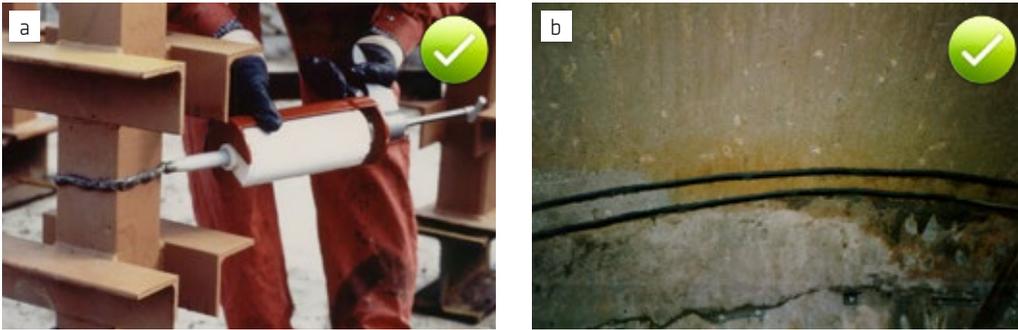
Examples of waterproof joint sealing with swellable adhesive sealants
